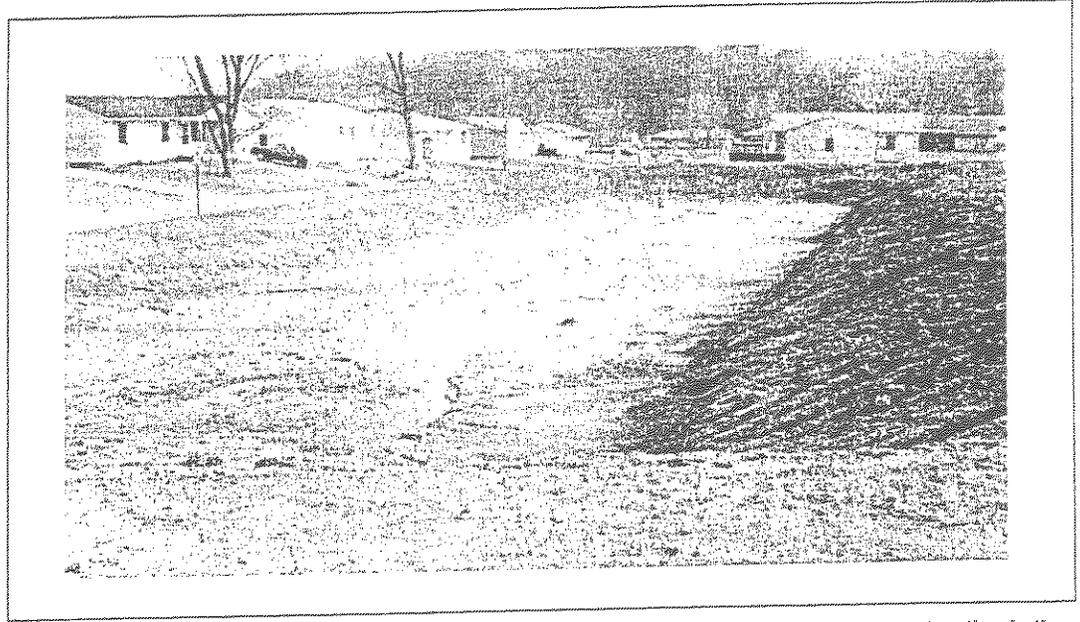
A. This temporary sediment basin will be used as a dry detention pond after construction in the area is completed and the site stabilized.
